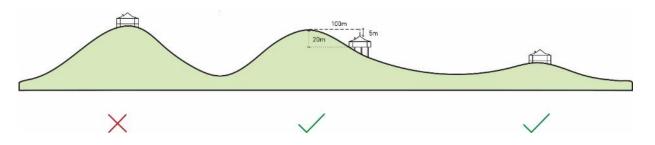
HOUSE ON RIDGE – POOR OUTCOME VS HOUSE ON SLOPE AND HOUSE ON ROLLING HILLS GOOD OUTCOME
